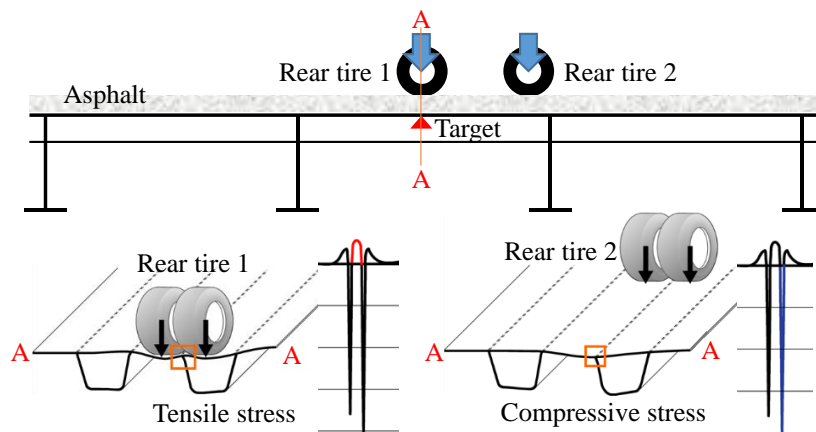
Field measurements in loading test of orthotropic deck bridge
